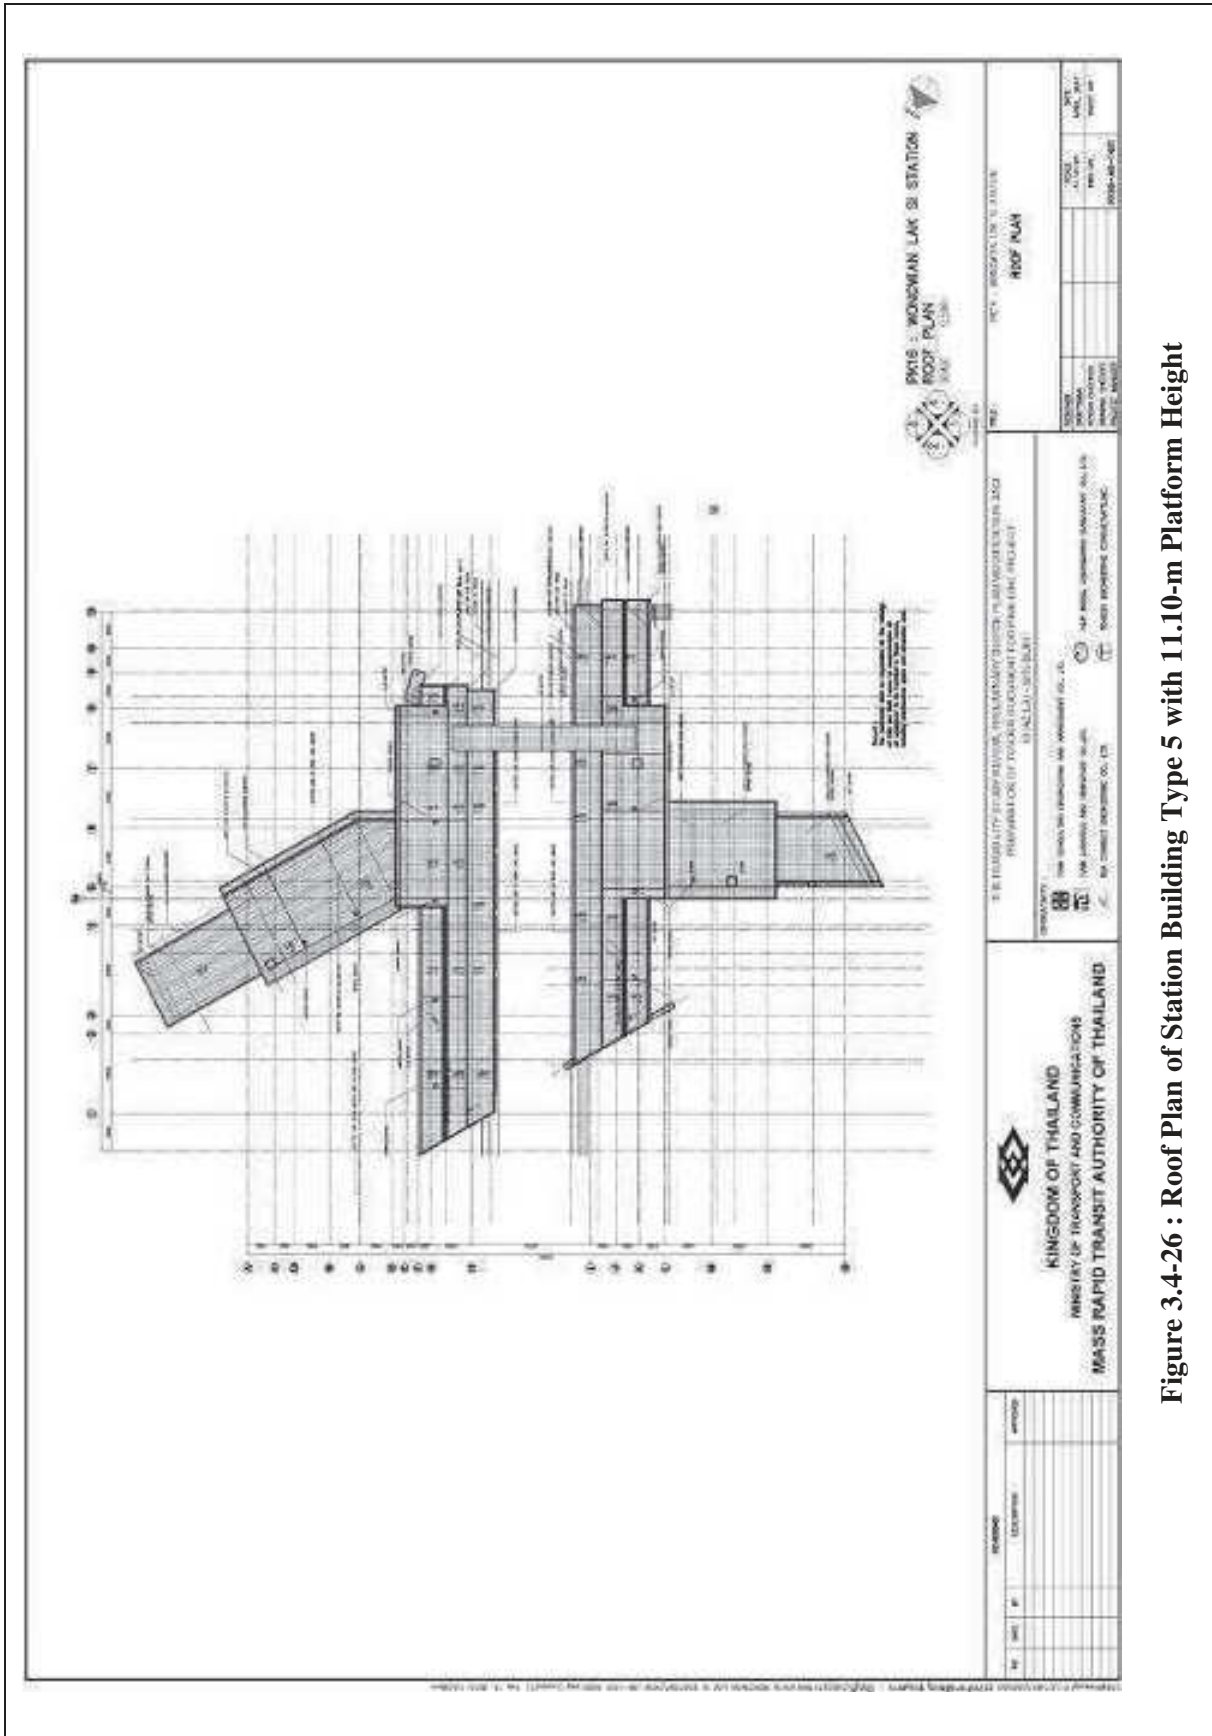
Roof Plan of Station Building Type 5 with 11.10-m Platform Height
